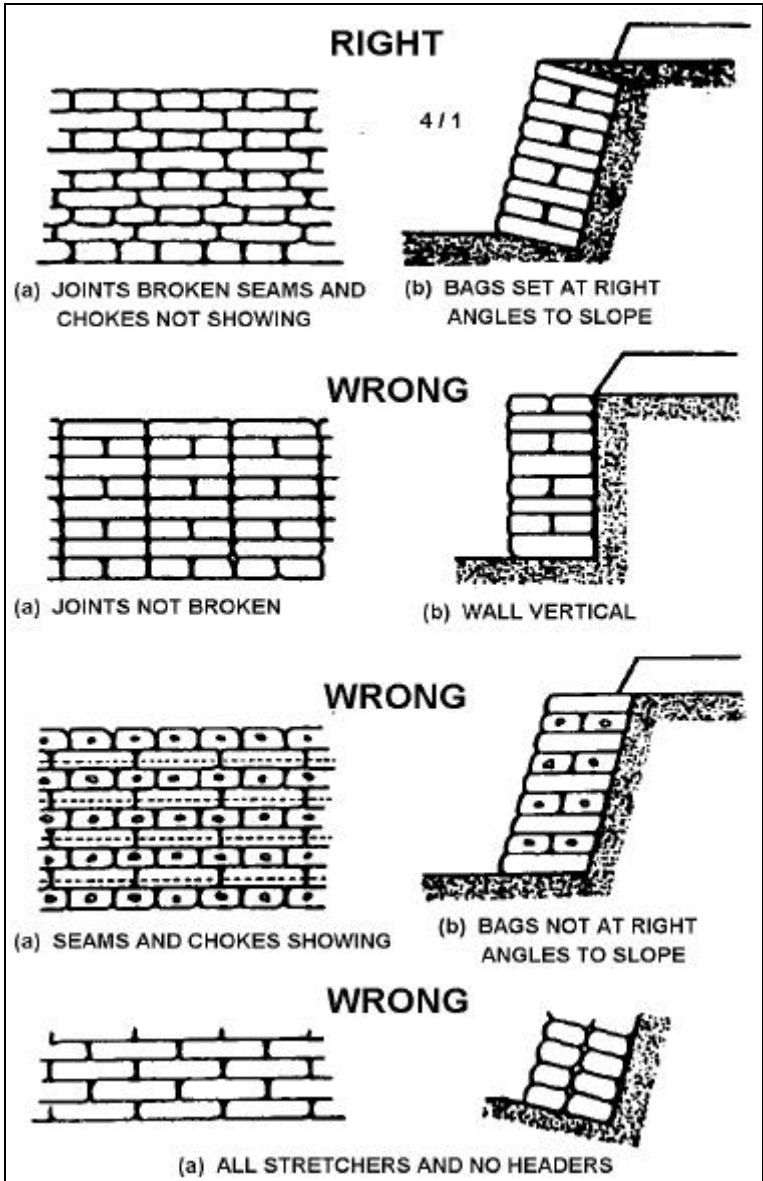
Examples of Correct Sandbag Wall Construction and Typical Mistakes
